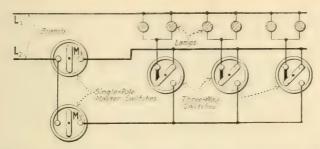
Universal mastering of single-location-controlled lamp-groups using two single-pole master switches.
